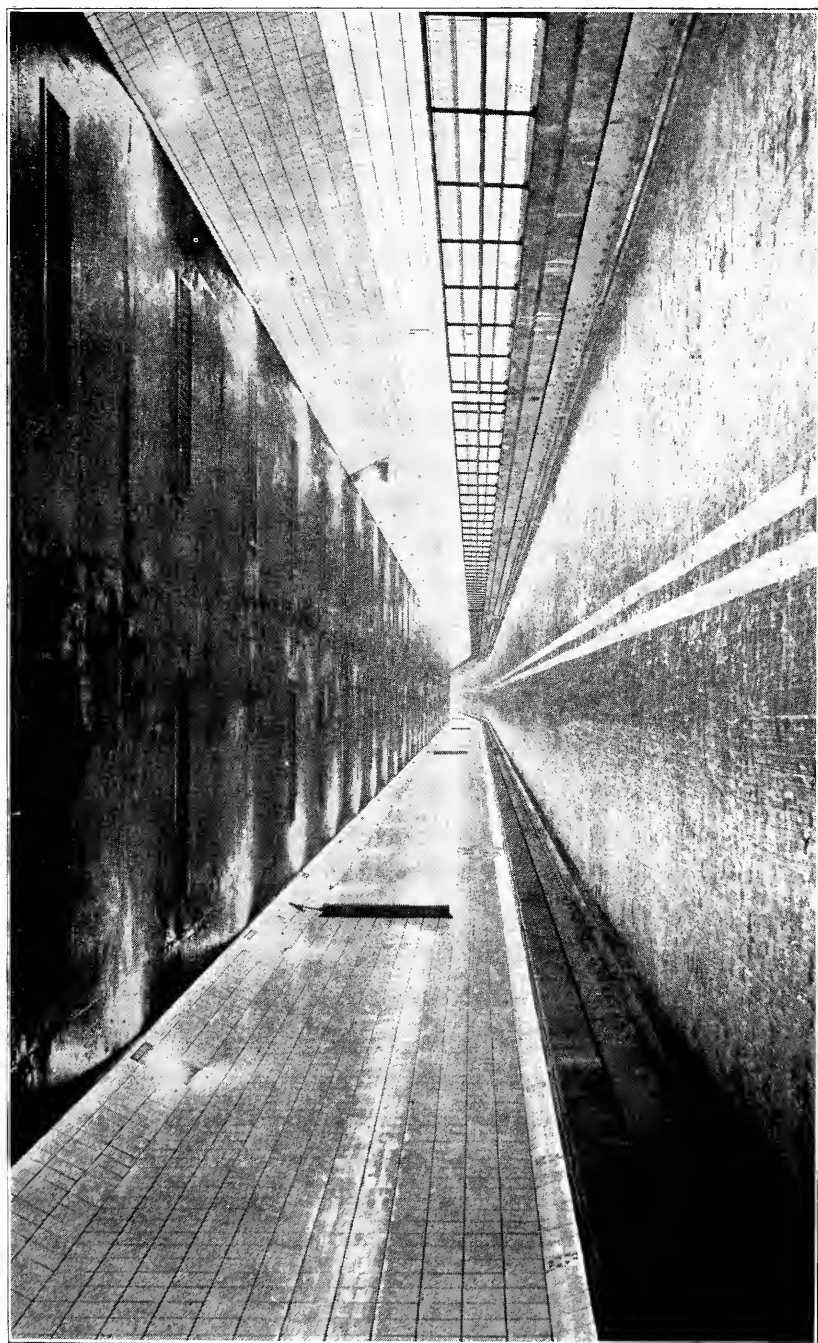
PLATE I.—INTERIOR VIEW IN FINISHED TUNNEL, LOOKING TOWARD BOSTON.
